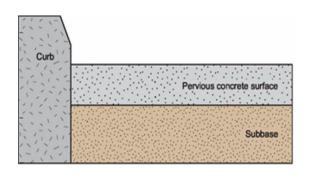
Cross section of pervious concrete. Source:http://www.perviouspavement.org/ engineering%20properties.htm (Figure 2.3 and 2.4)
